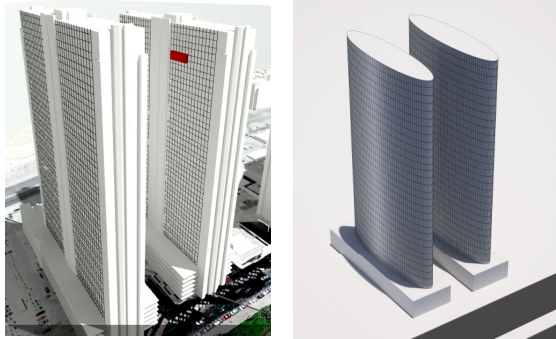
Alternative proposed plans tested, rectangular (left) and oval (right).
